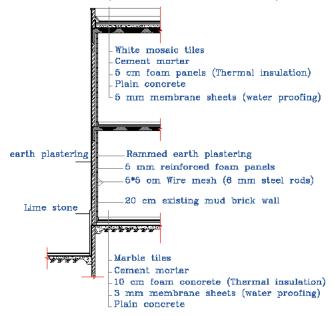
Proposed Villa (a) Wall section details scale 1/100
